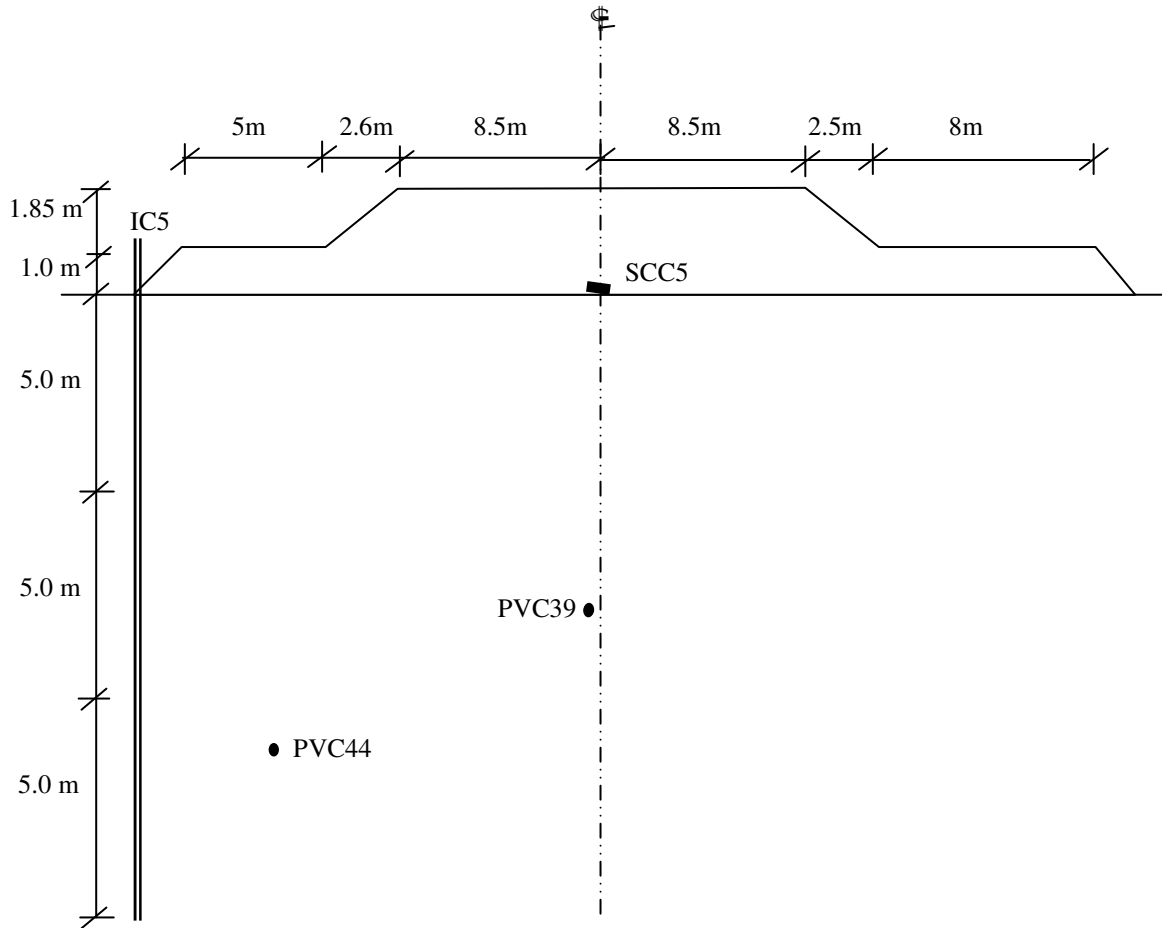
Instrumentation Layout for Section C (Elevation View)
